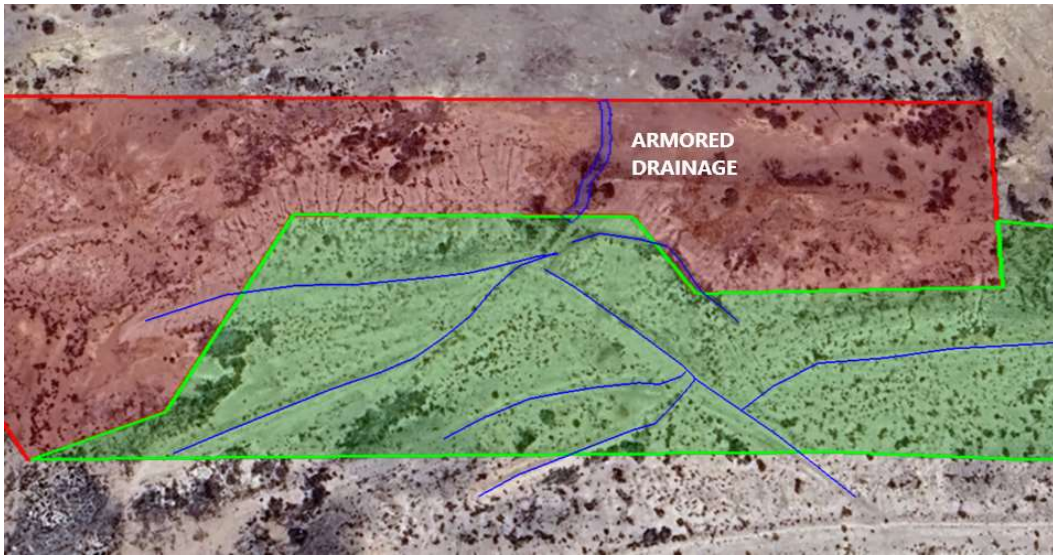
Existing water collection & Proposed Armored Drainage in the Cypress North Slope Area
